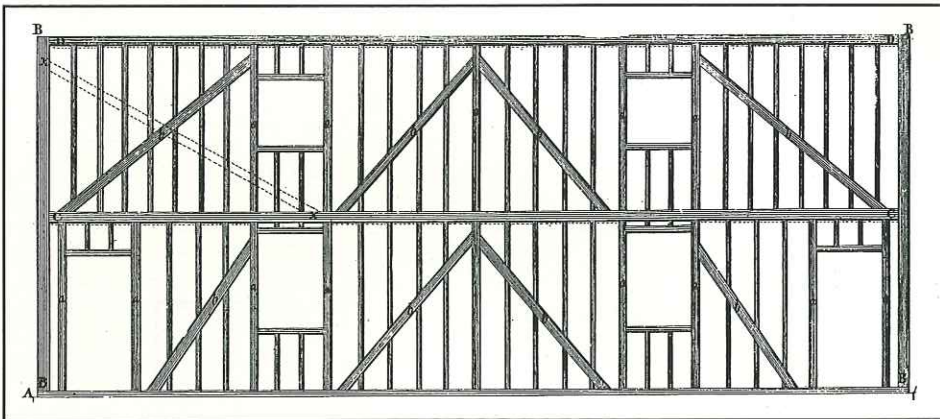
The framing for the front elevation of a pair of cottages, from John Wood's Plans for Cottages, 1806.
